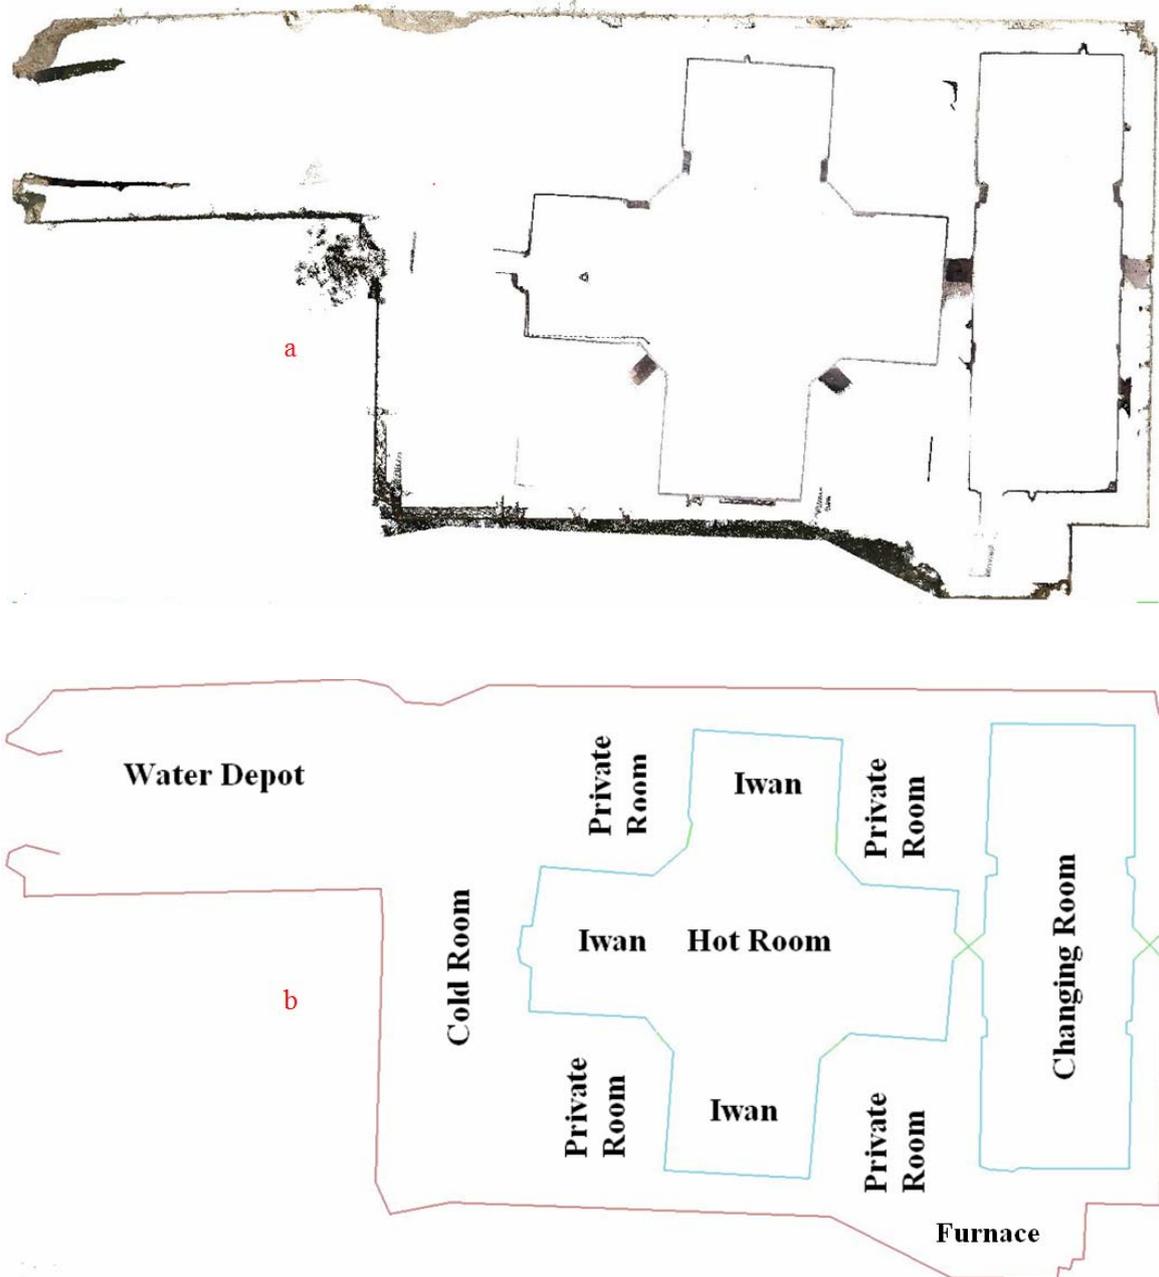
a: Plan view of point cloud bath; b: 2D plan drawing of bath on point cloud.
